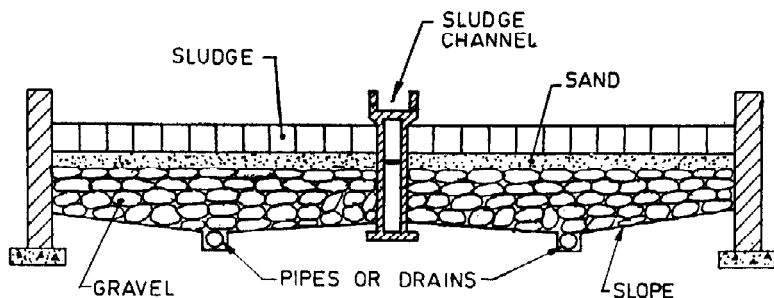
TYPICAL DETAILS OF SLUDGE DRYING BED
